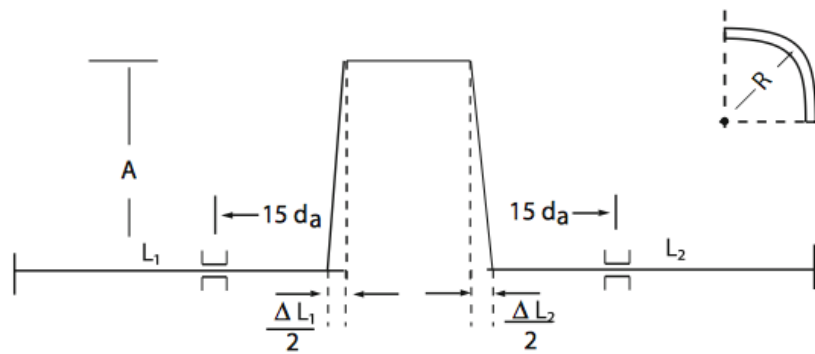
U-bend expansion joint movable mounting (figure taken from [48, p. 98])
